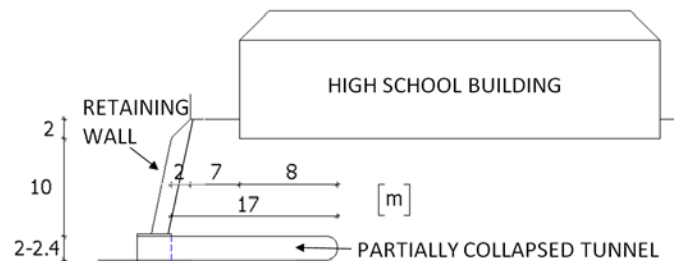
Schematic cross-section of high school building with position of collapsed tunnels.
